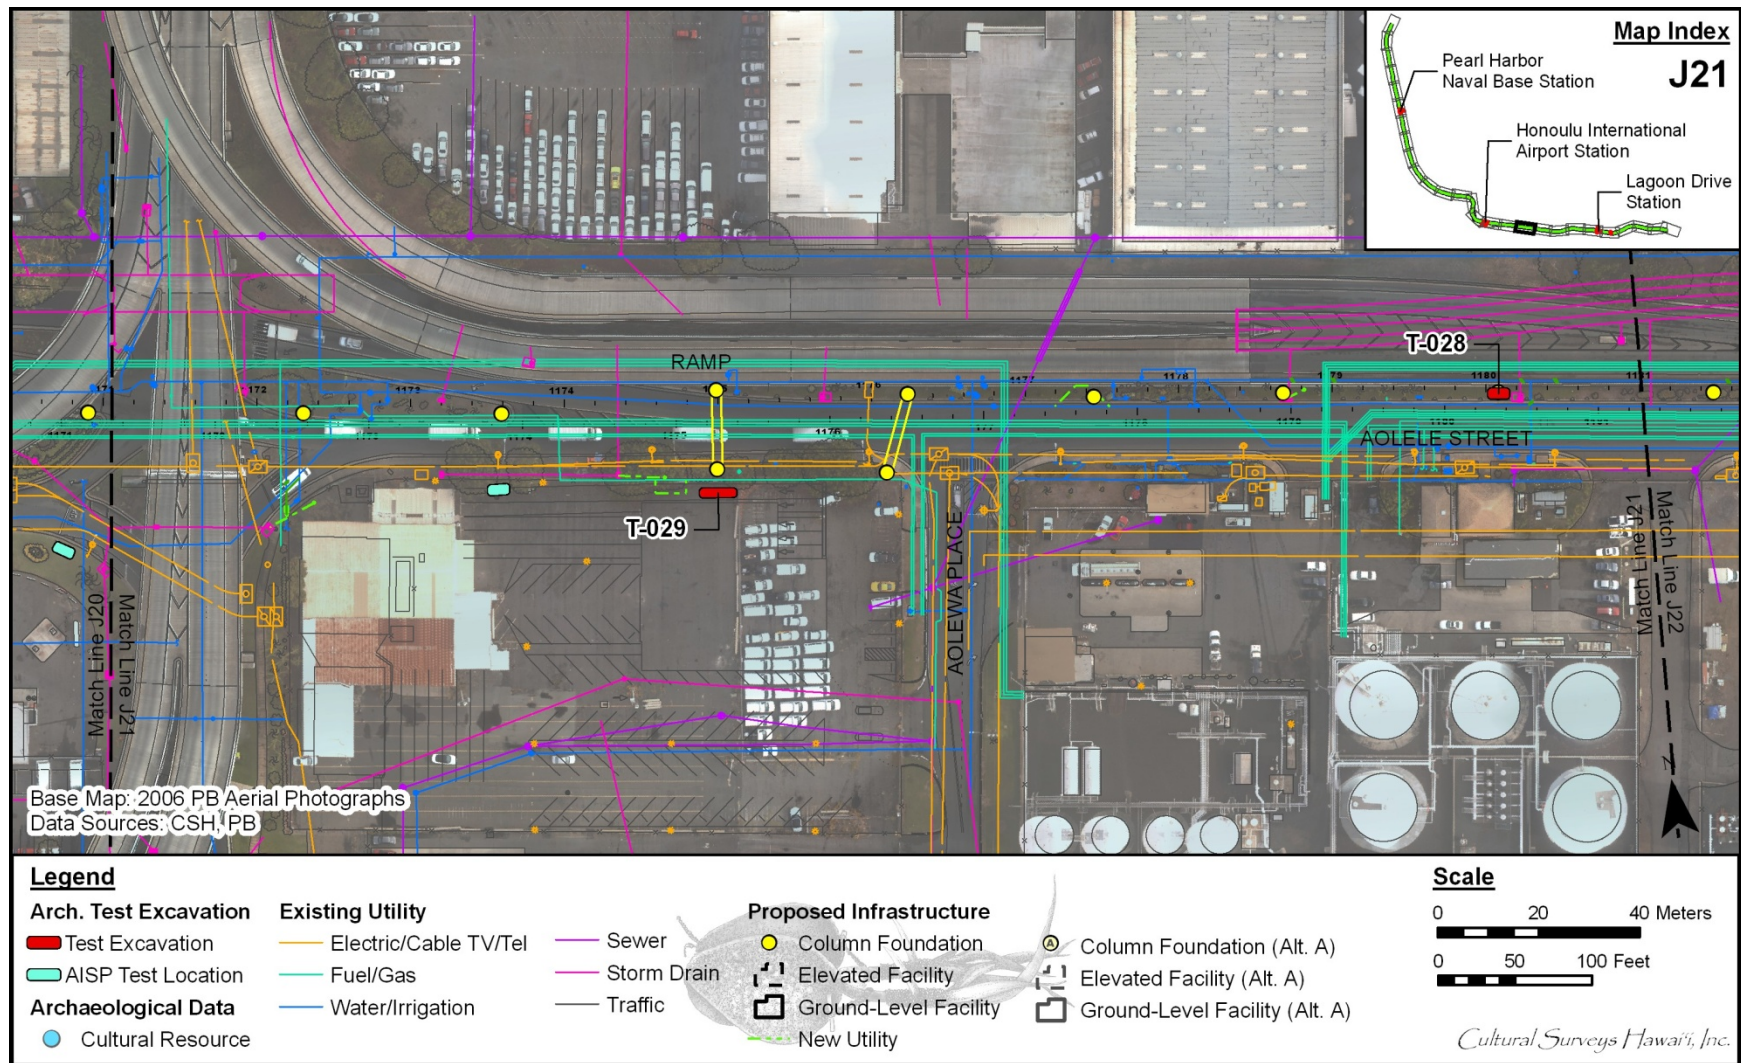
Map Sheet J 21 (along Aolele Street), two test excavations (T-028 and T-029) at (makai) column foundation @ 1162+50
